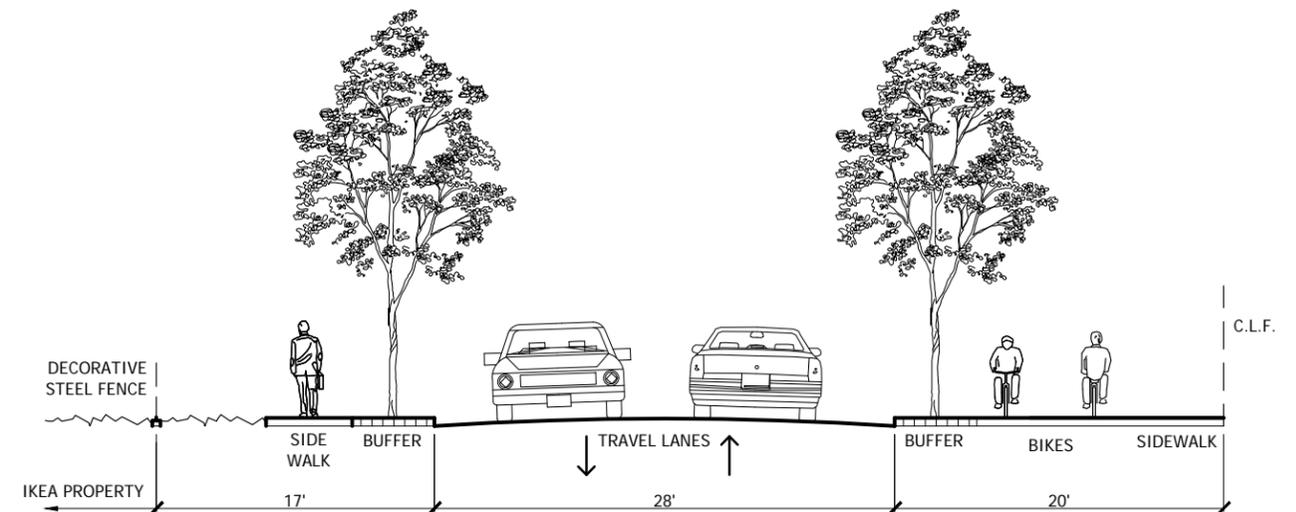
Possible configuration for Columbia Street opposite Erie Basin Park and adjacent to Gowanus Industrial Park
